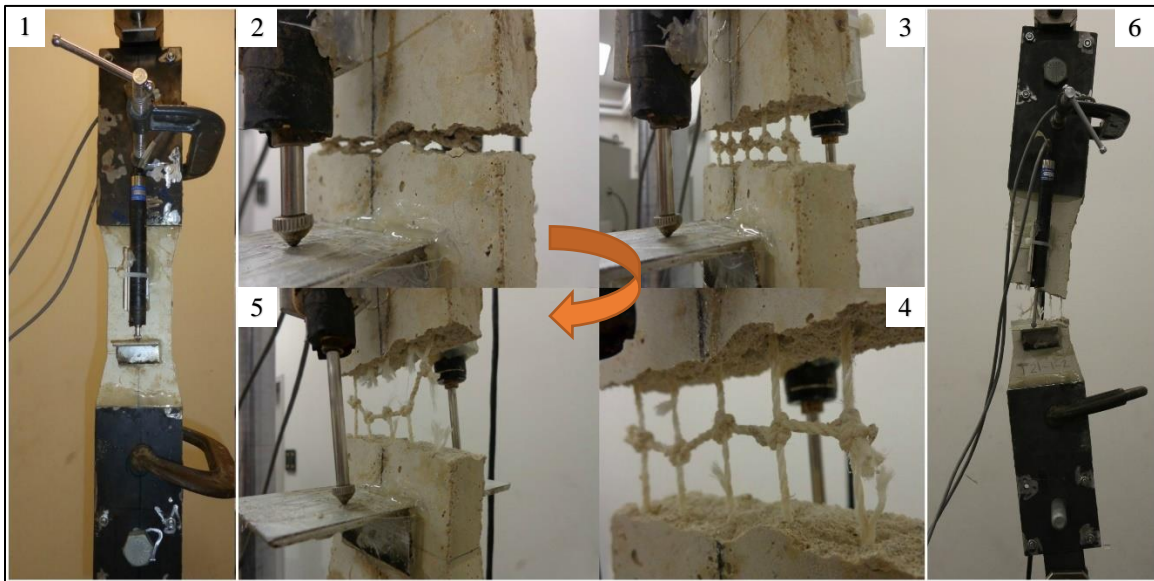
Dog-bone composite specimen during testing (#21 FN, 1 layer), (1) uncracked specimen, (2) mortar cracking, (3) crack expansion, (4) partial thread failure, (5) complete thread failure, and (6) failed specimen.
